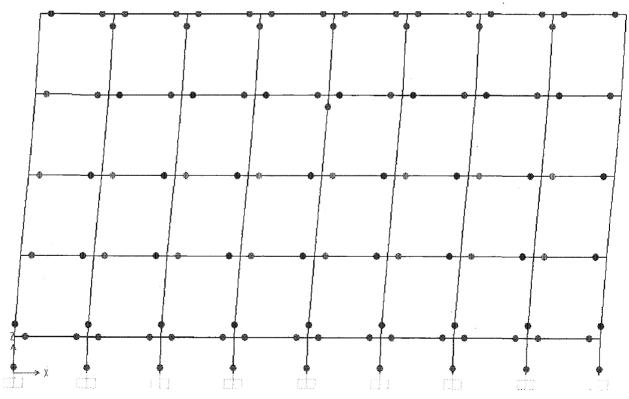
Yield Pattern at Ultimate Point for Bare Frame Building Designed as SMRF in Longitudinal Direction
